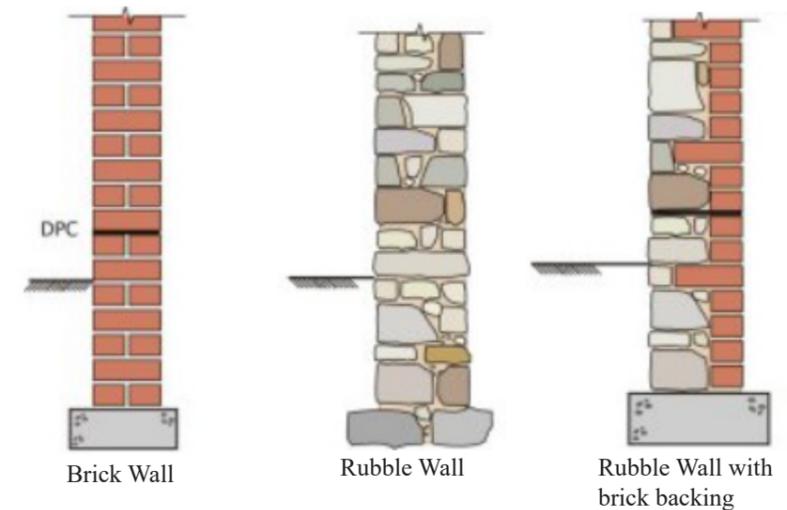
| The development of wall systems throughout the history of construction.
